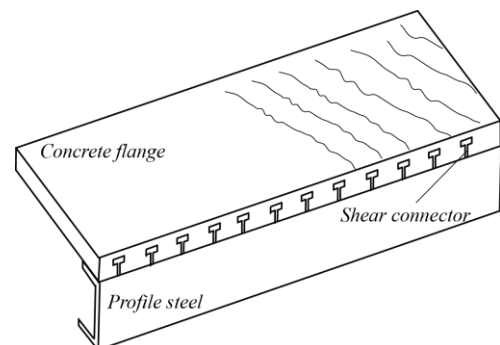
Cracked concrete flange sustaining hogging moment
